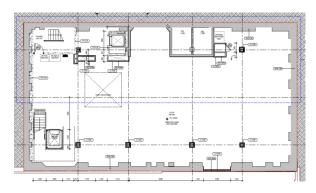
Beneficial House—Floor Plan, concourse level—showing proposed new stair and lift. (Source: Make + Architectus, A-285-11-03-0, 28 March 2019)
